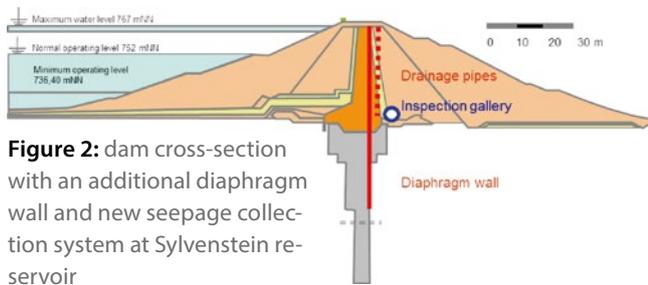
dam cross-section with an additional diaphragm wall and new seepage collection system at Sylvenstein reservoir
